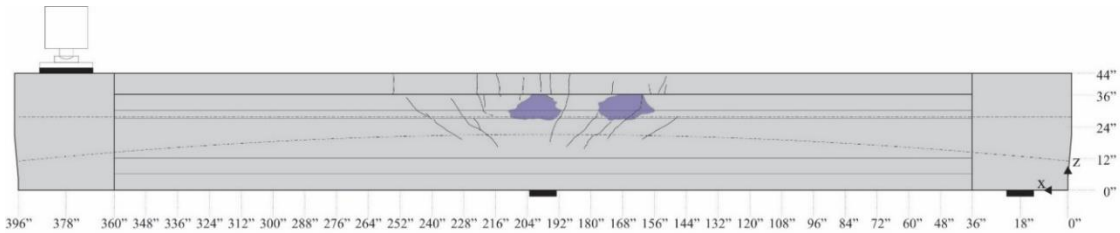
Beam specimen NB-3 crack pattern: west side (repairs prior to test are shown in light blue)
